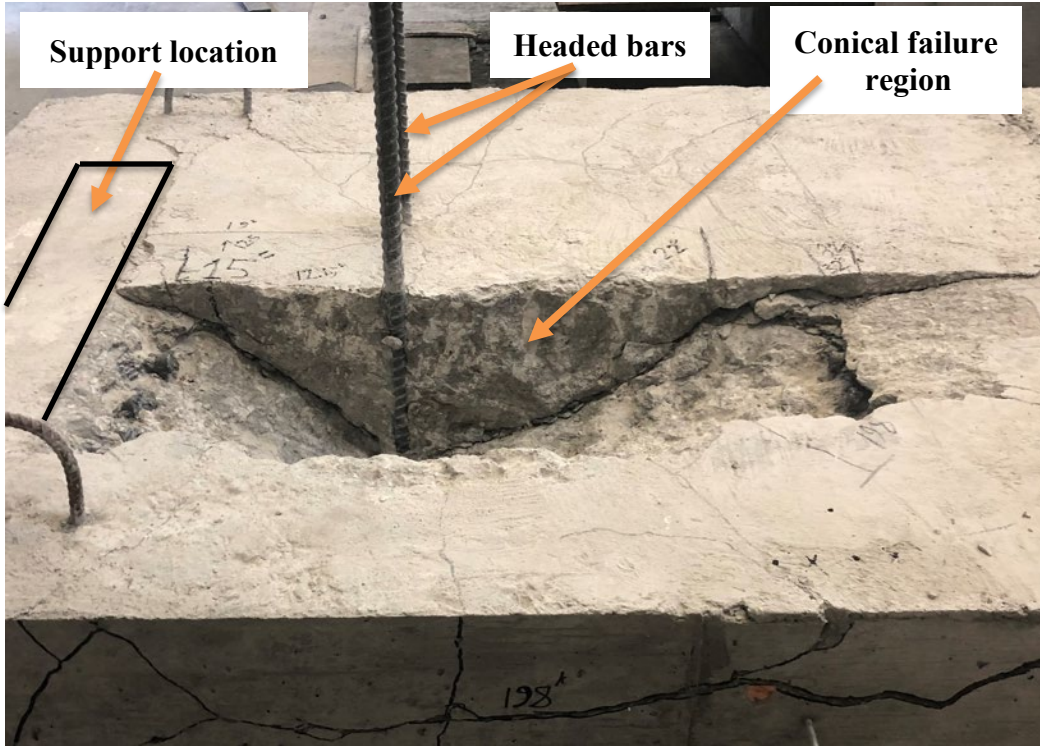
Concrete breakout failure. Slab Specimen 5 (test 1, 11-5-S5.5-6#6-2#4-12.75) with both support reactions just outside anticipated failure region (test had one headed bar with parallel tie reinforcement on both sides of headed bar)
